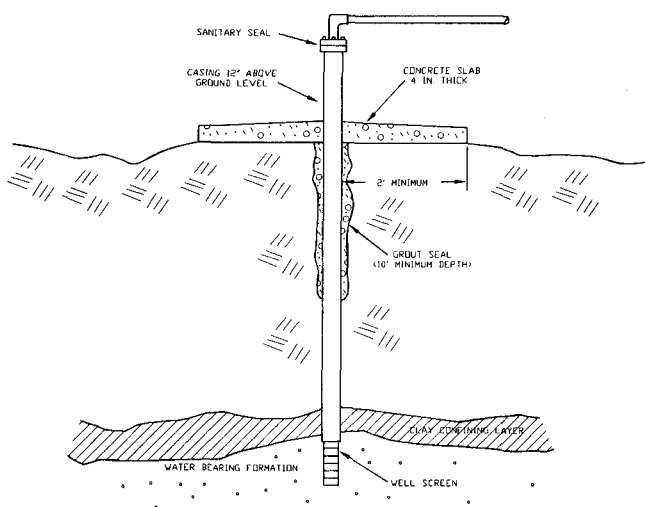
Typical Well Showing Proper Construction to Prevent Contamination
